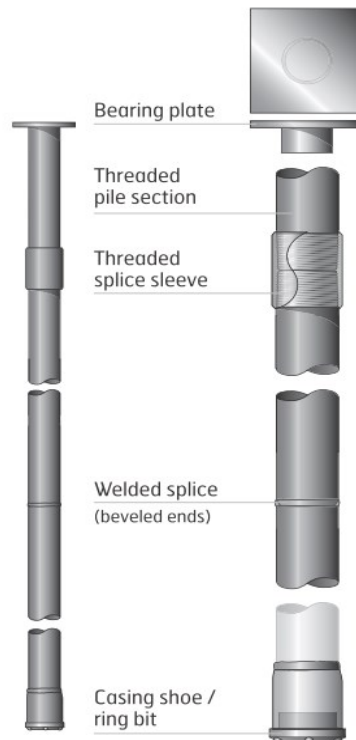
RD Steel pipe pile (SSAB 2016, p.9)
